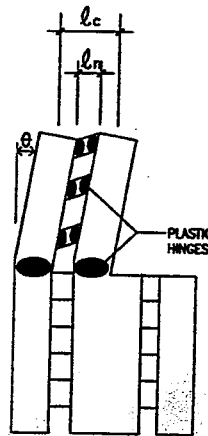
Mechanism with plastic hinges at 4th floor wall piers
